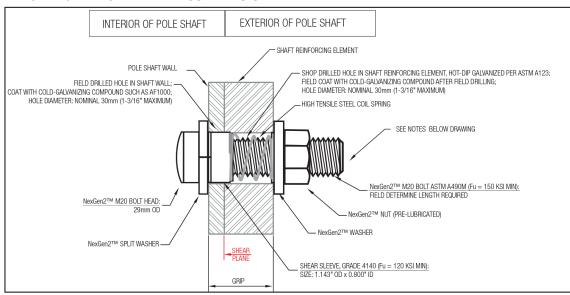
NEXGEN2™ ONESIDE BLIND BOLT INSTALLATION INSTRUCTIONS
